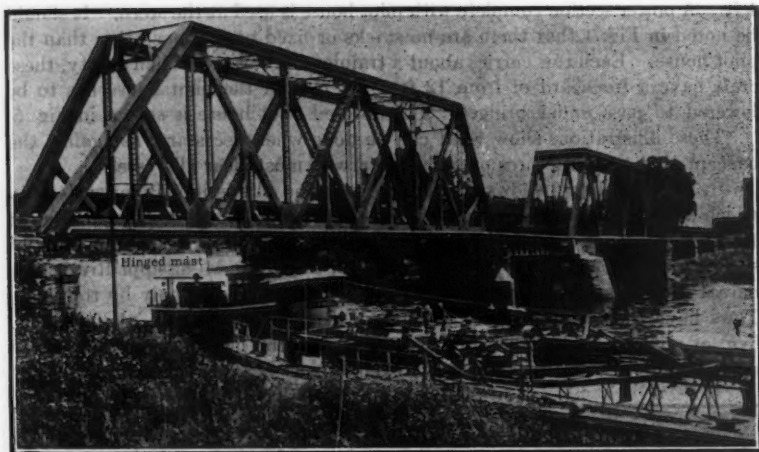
TYPICAL BARGE CANAL OIL TOW WITH HINGED MAST AT STERN
